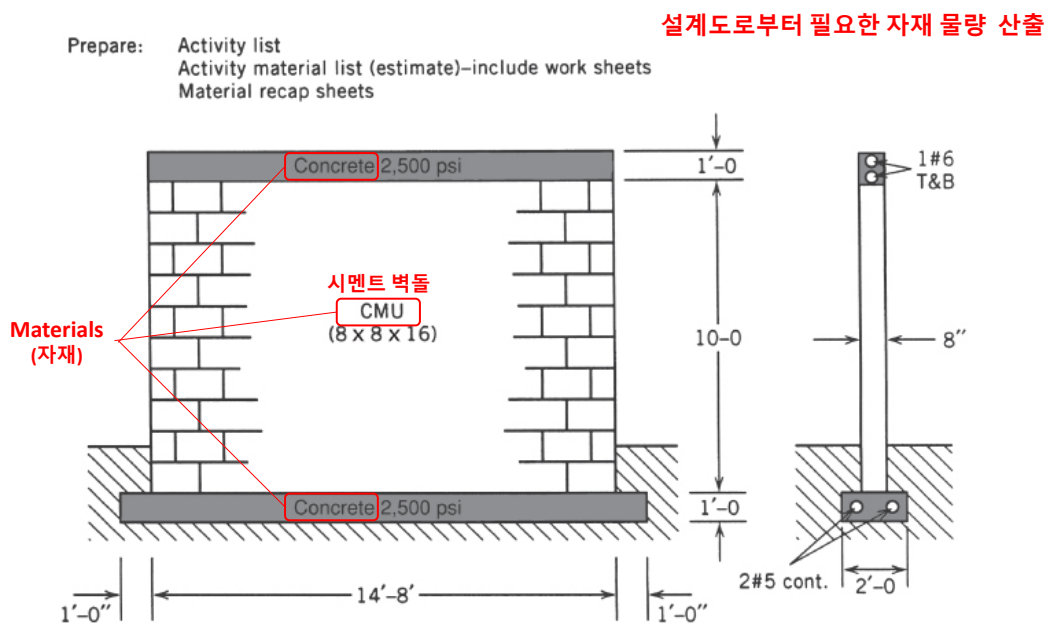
Small wall construction (CMU is concrete masonry unit)
